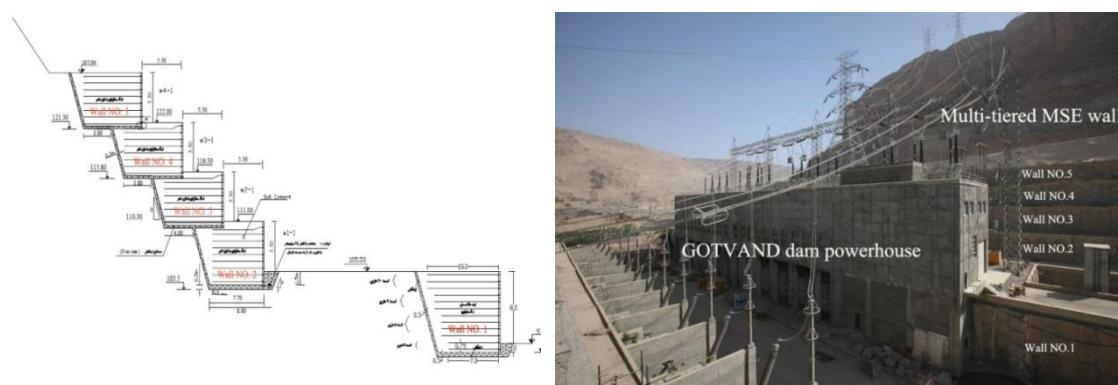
View and cross section of multi-tiered reinforced soil walls in Gotvand dam powerhouse
